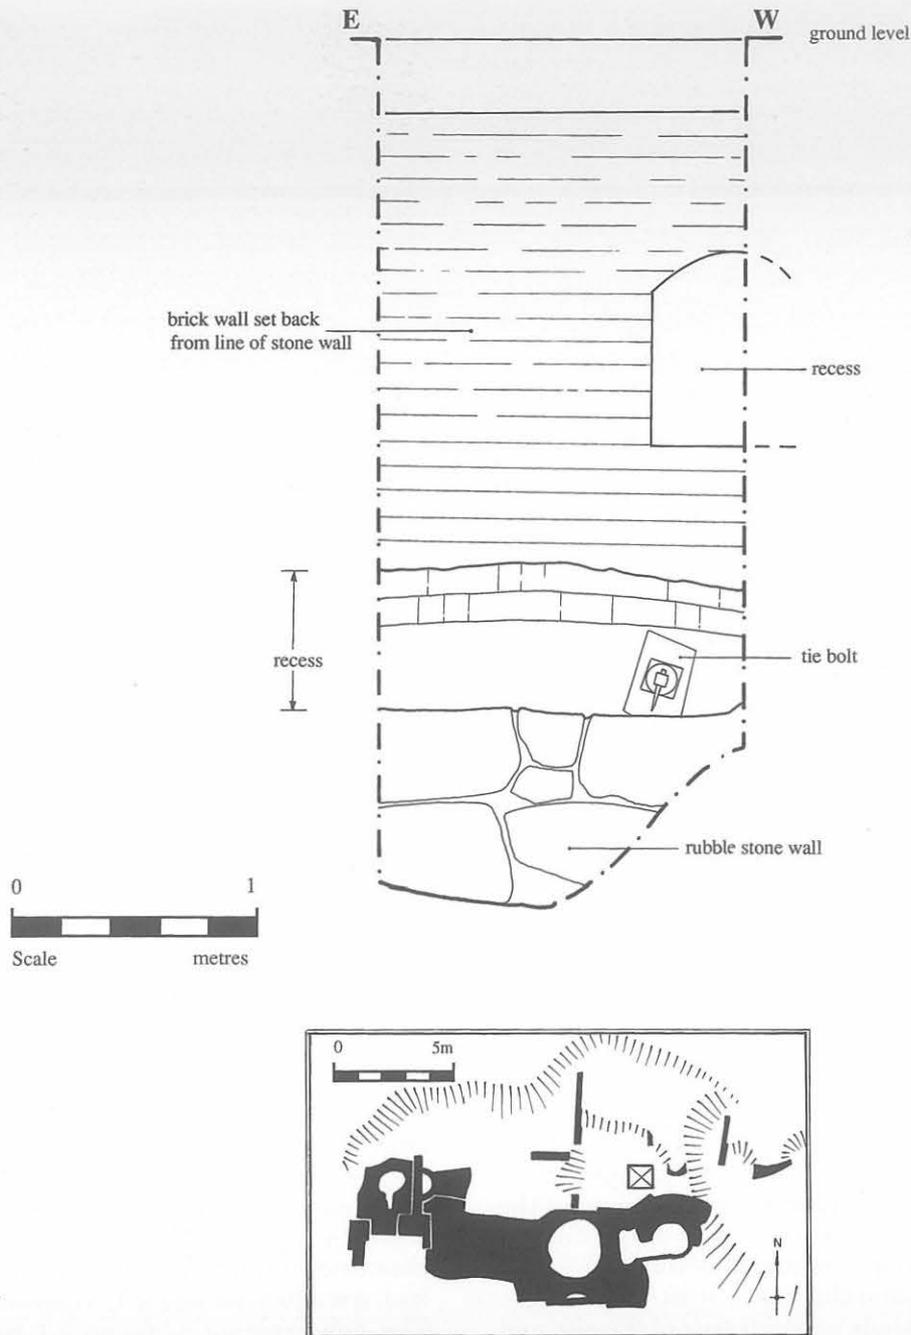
A test pit excavated through the charging platform on the north side of furnace II, revealing the rear walls of the structure.
